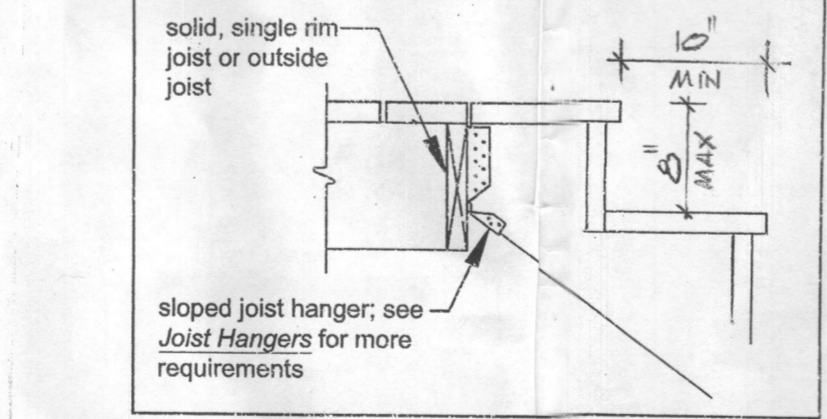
STAIR STRINGER ATTACHMENT DETAIL
